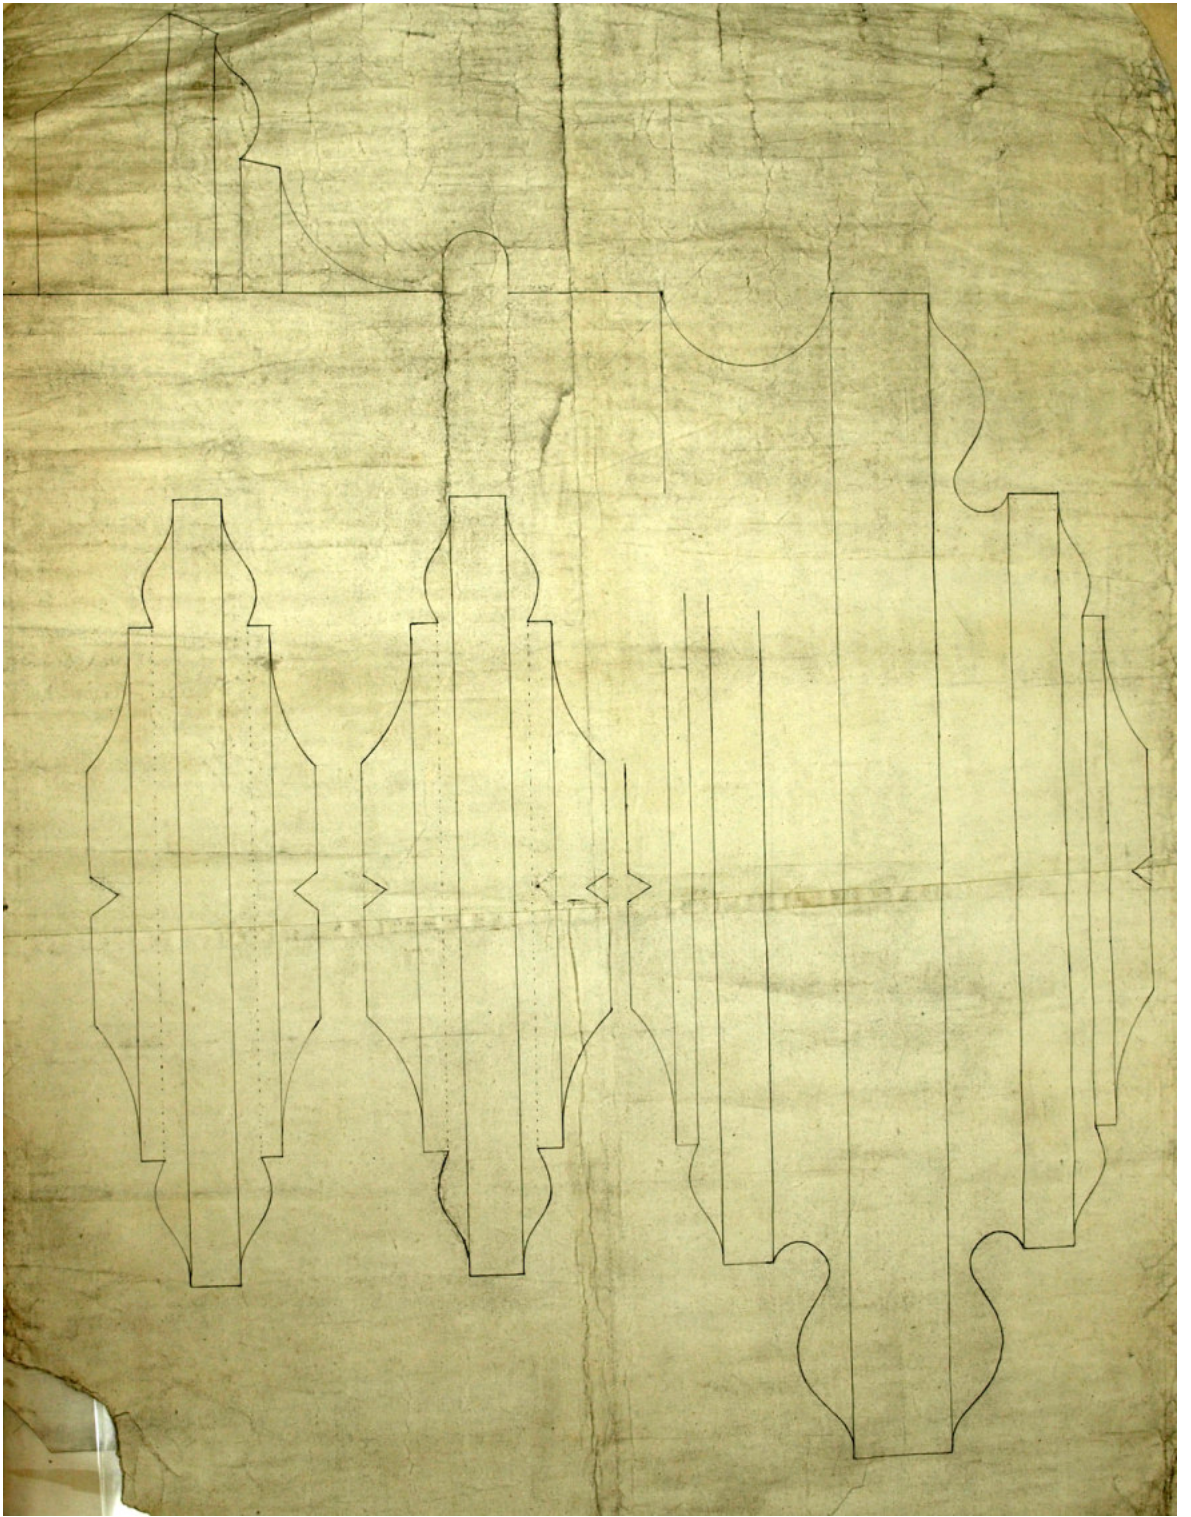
Great East Window moulding profiles, William Shout c.1824-1825 (YML/4/1/9)
